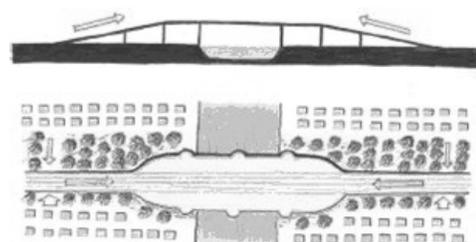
Schematic illustration of escape bridge (JICA, 2005)
